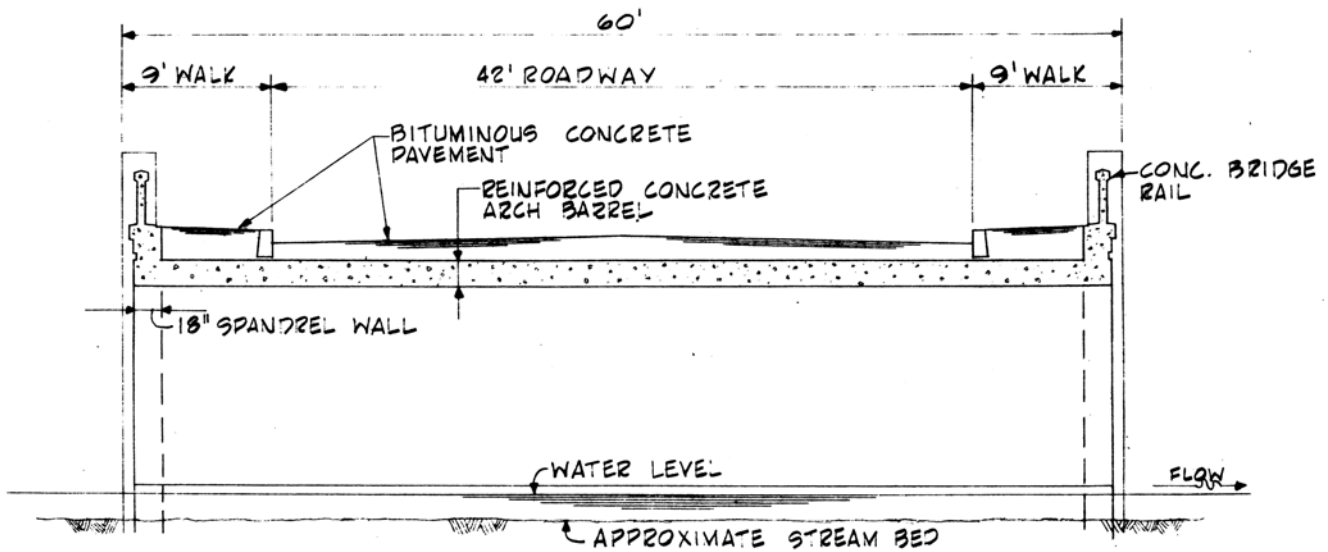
Transverse section through Franklin Street Bridge at the crown of the arch.
